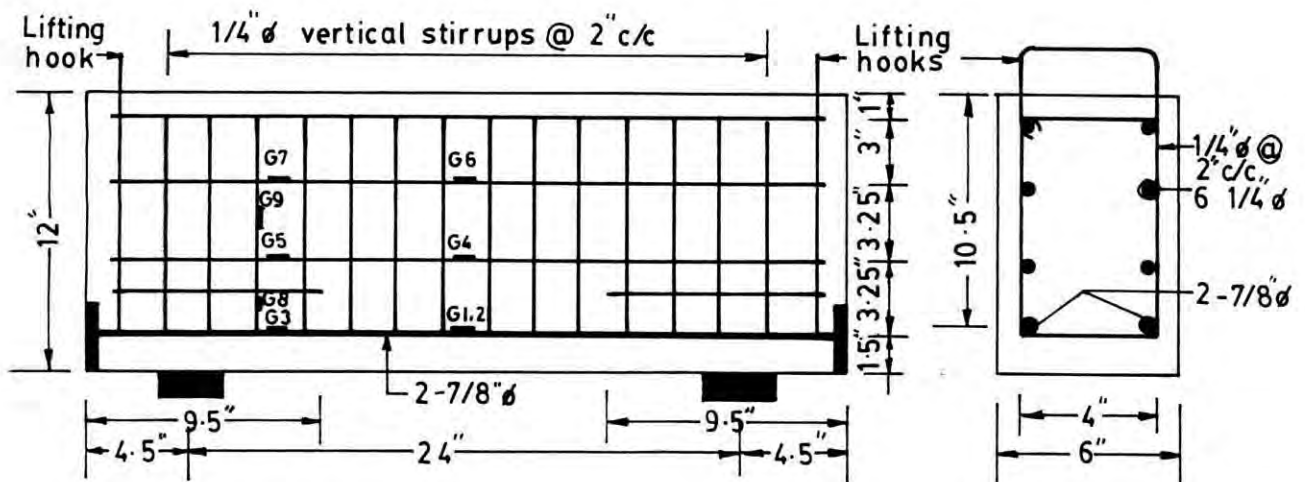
Reinforcement arrangement beam DB-Q7
